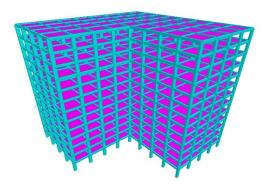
(c) – 3D view of Model 1 (Normal Building)
